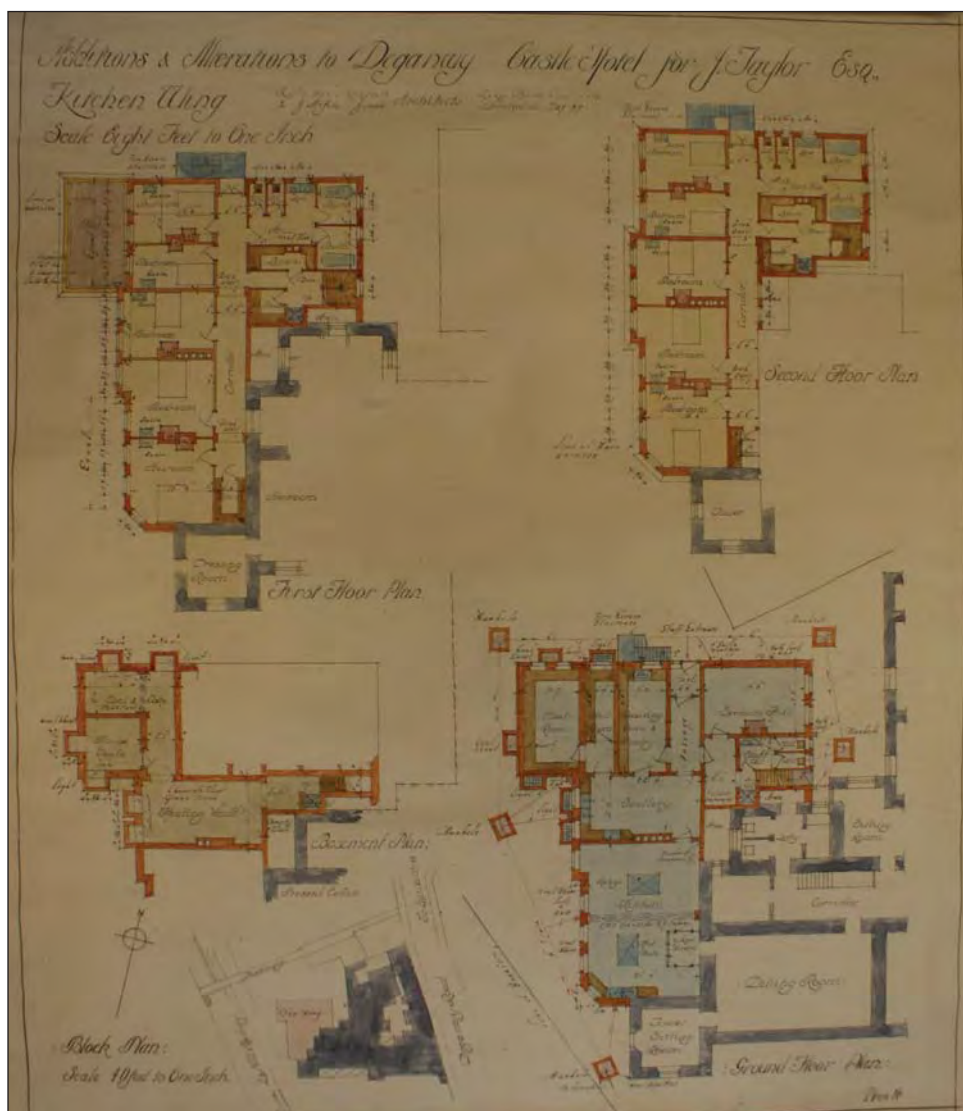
1919 Architects Plan of Deganwy Castle Hotel 1919 Extension (Source: Conwy Archives C Maps & Plans 22/3)
